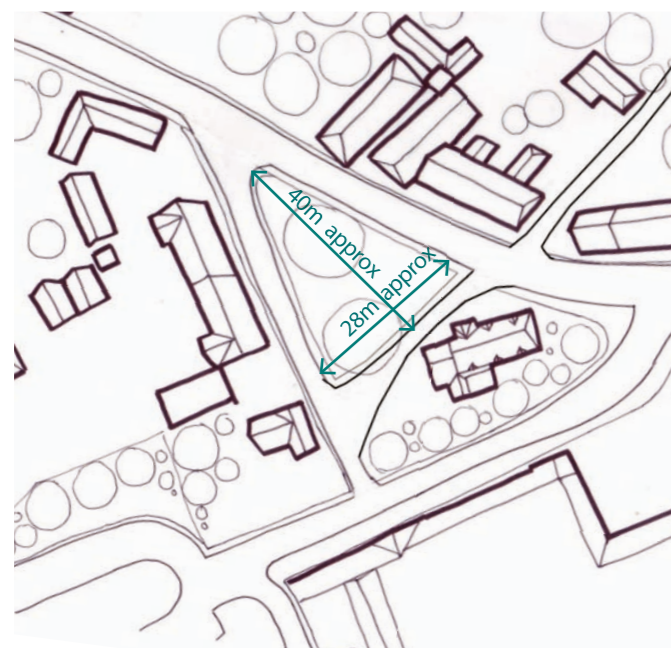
Plan of a public green space in Towcester, highlighting its dimensions that are in keeping with the scale of the space and its surrounding built form
